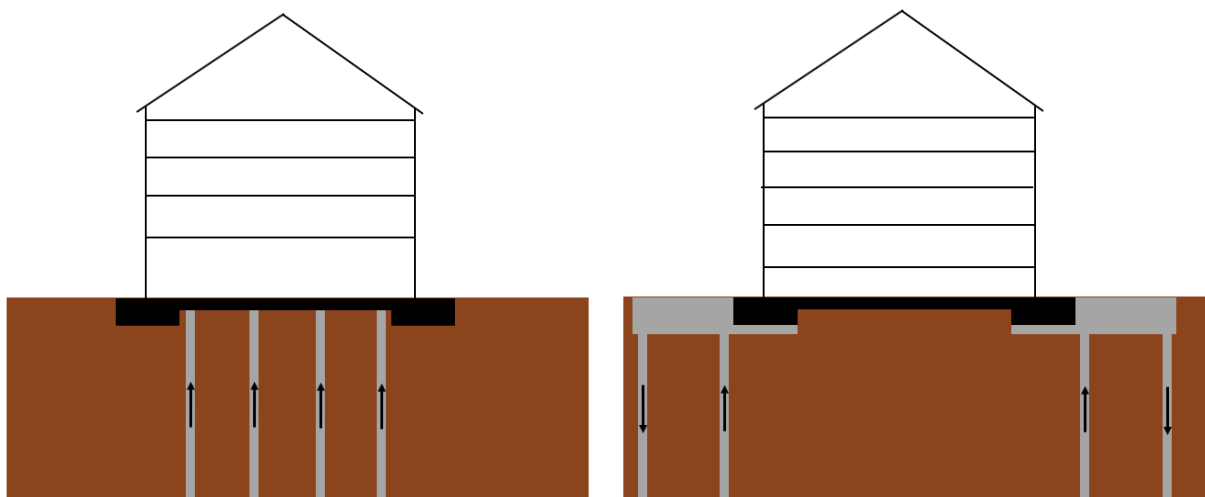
a) Reinforcement by piles underneath a building. b) Reinforcement by piles on the side of a building. Inspired by Thorburn & Littlejohn (1993).
